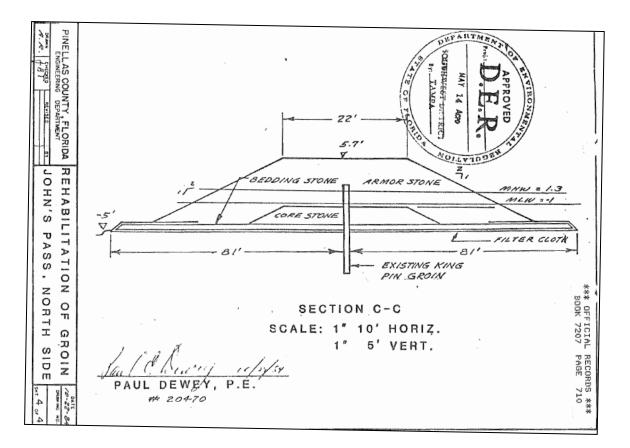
Typical Cross-Section for John's Pass Terminal Groin
